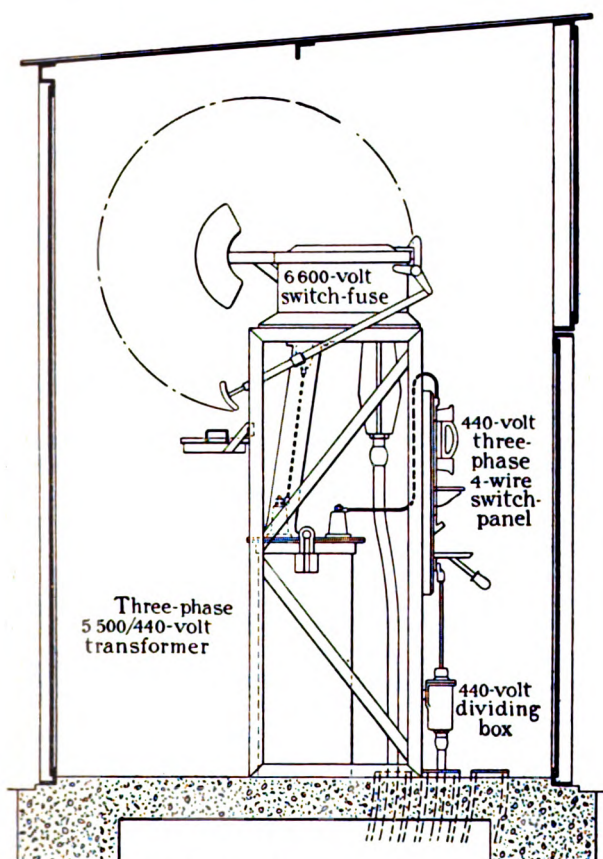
6 600-volt oil-immersed cut-out installation.
